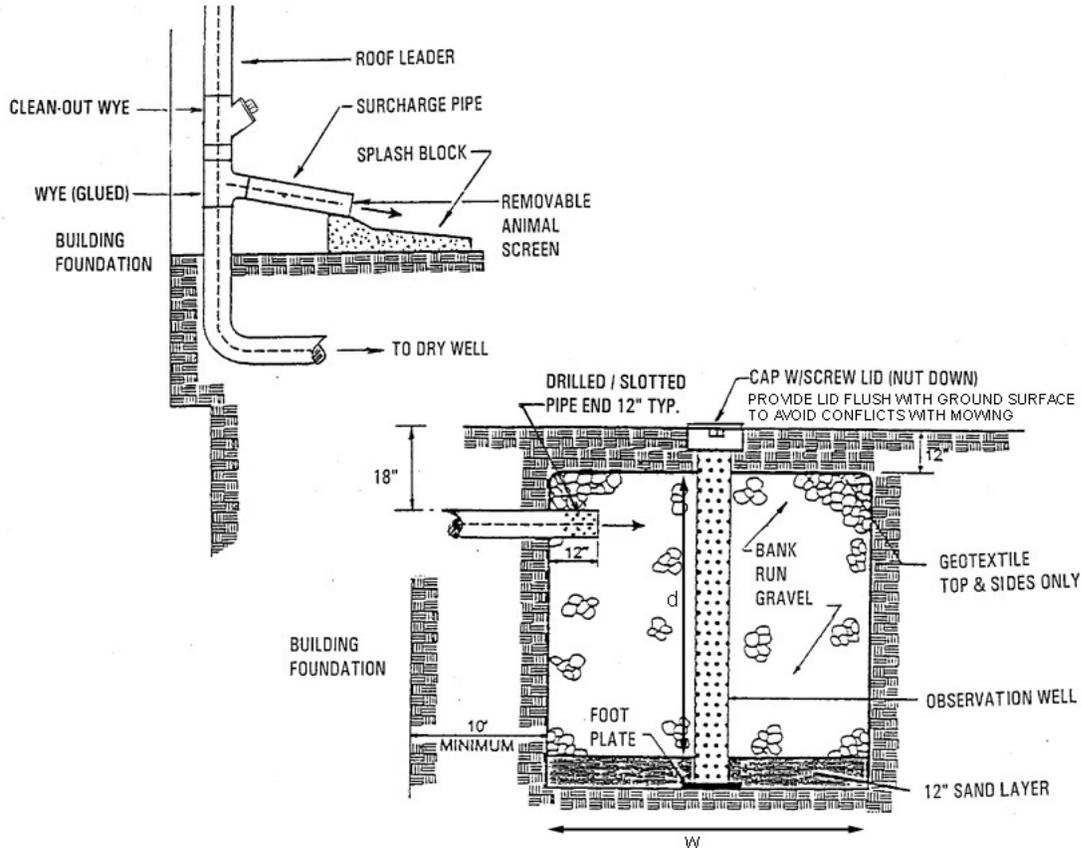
Schematic of Dry Well (Source: adapted after Howard County, MD)
